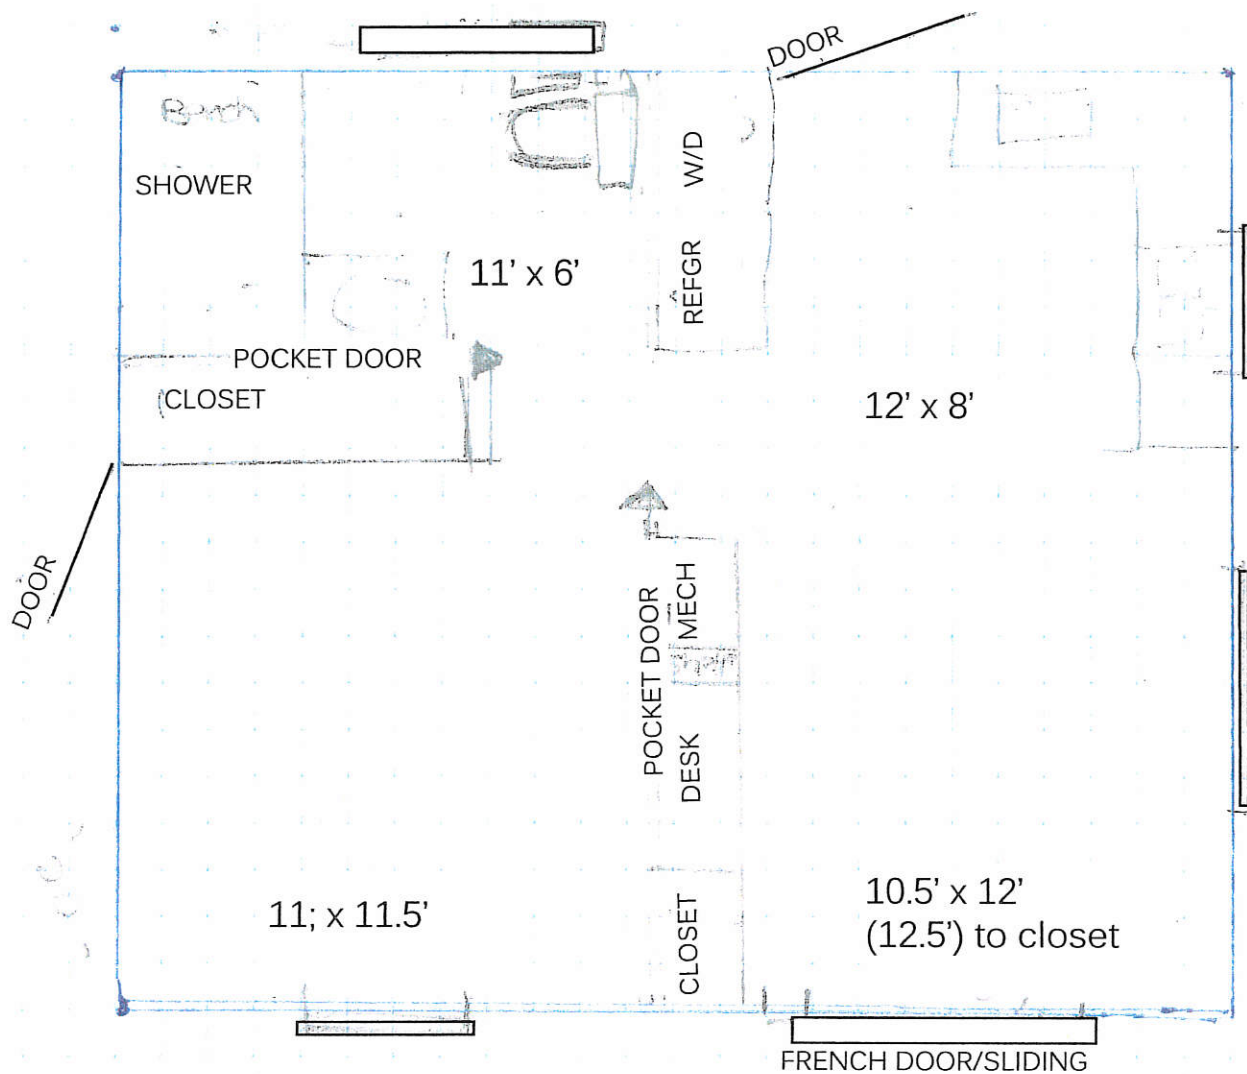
APPLICATION, SITE PLAN, ELEVATION
